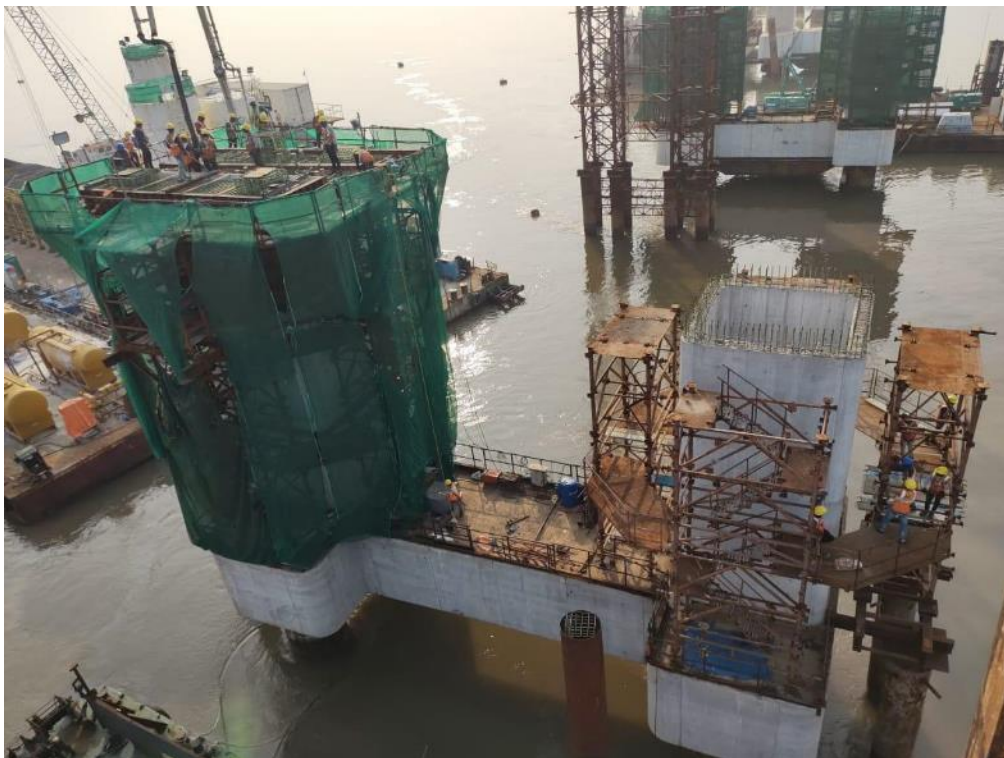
Concreting of Pier Cap – MP 148 South in progress
